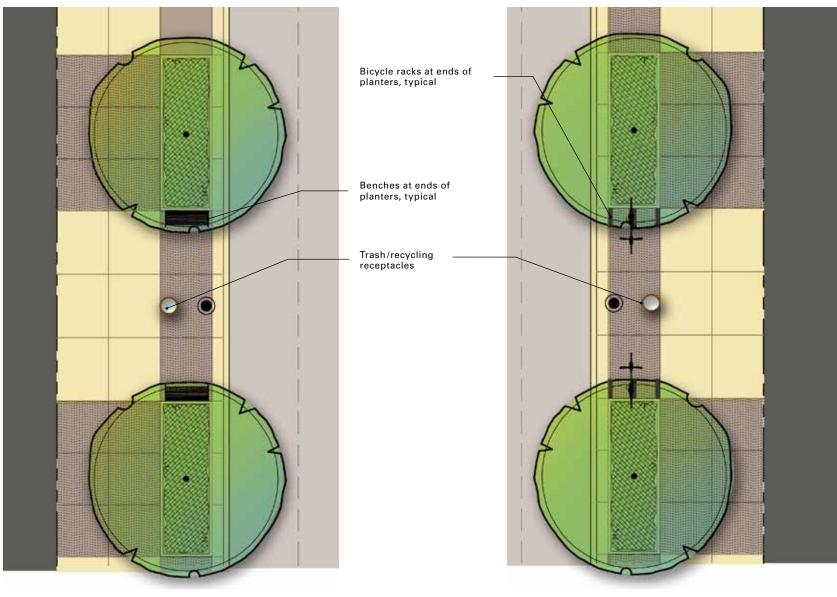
Example of street furniture configuration showing benches at the ends of planters with a trash/recycling receptacle and light post centered in between.
